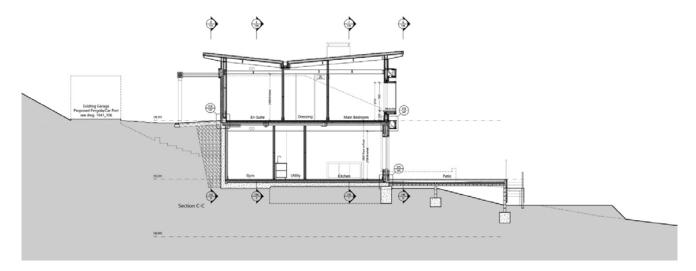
Proposed Section showing the two-storey property that appears as a bungalow from Fort Road (NTS)
